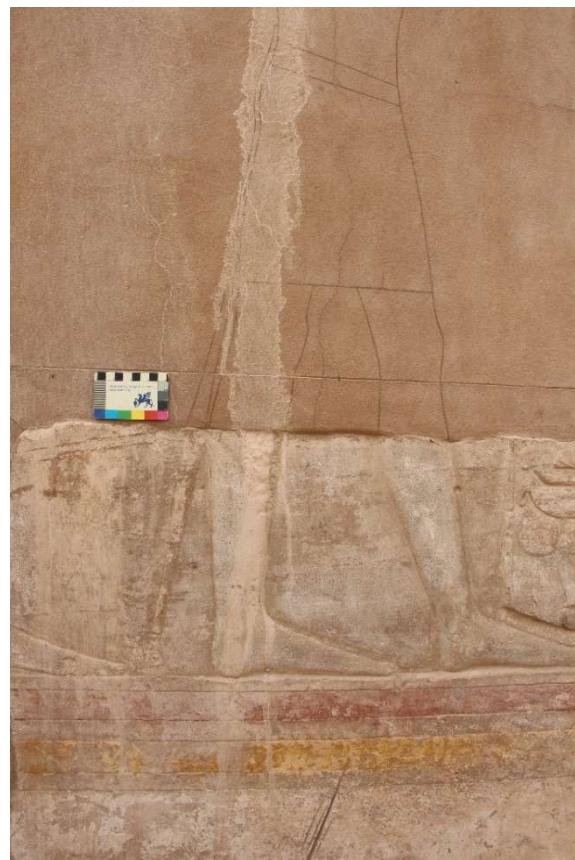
Dirt slurry runners over the plastered open areas and the original stone blocks (photo: E. Peintner, © DAI)
